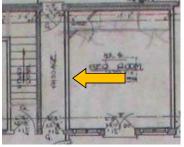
Original passage wall (now removed) as shown on the original plan.
